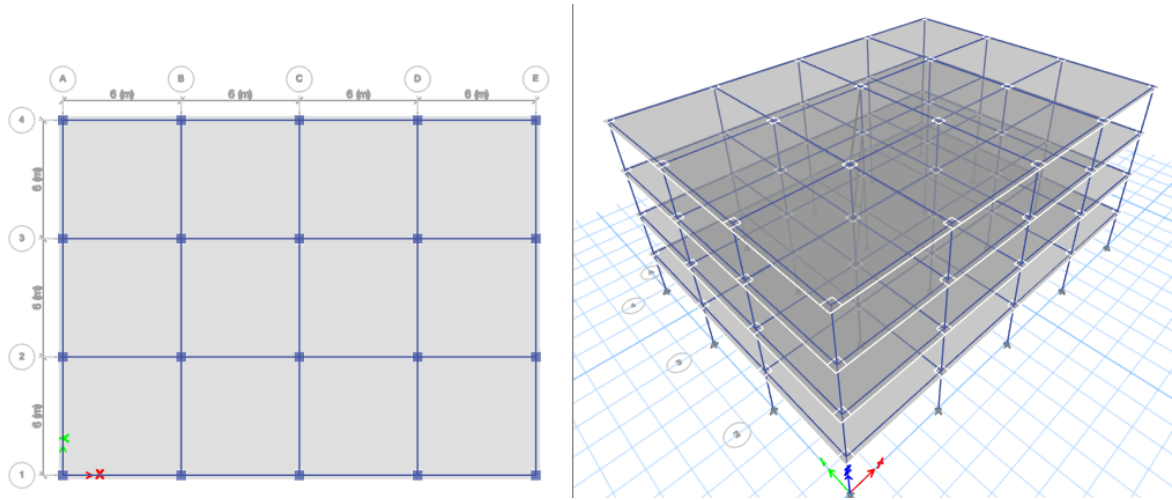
The Dimension and The Layout of The Multi-Story Structure Building.
